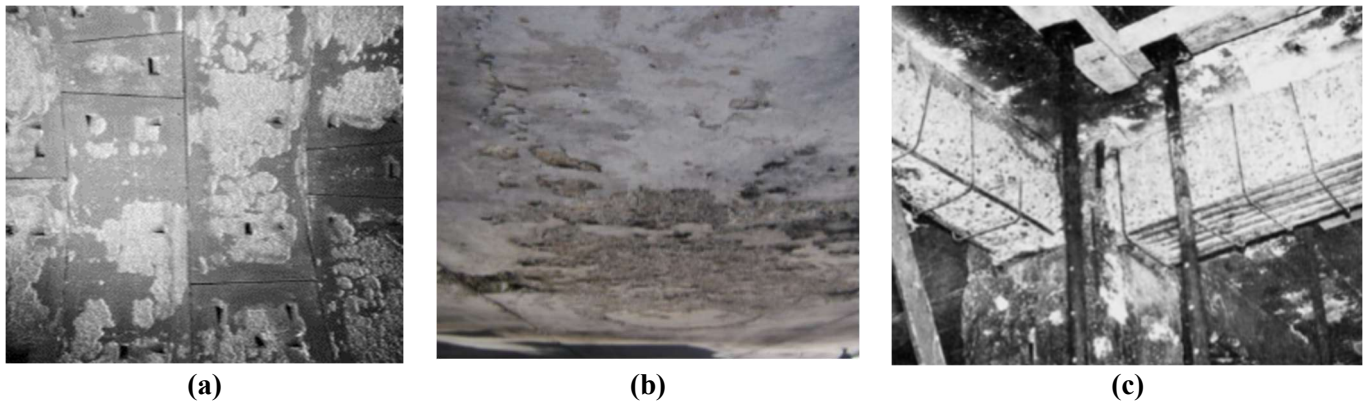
Concrete degradation due to temperature rise. (a) Superficial flaking; (b) moderate peeling; (c) spalling of the concrete revealing the reinforcements.
